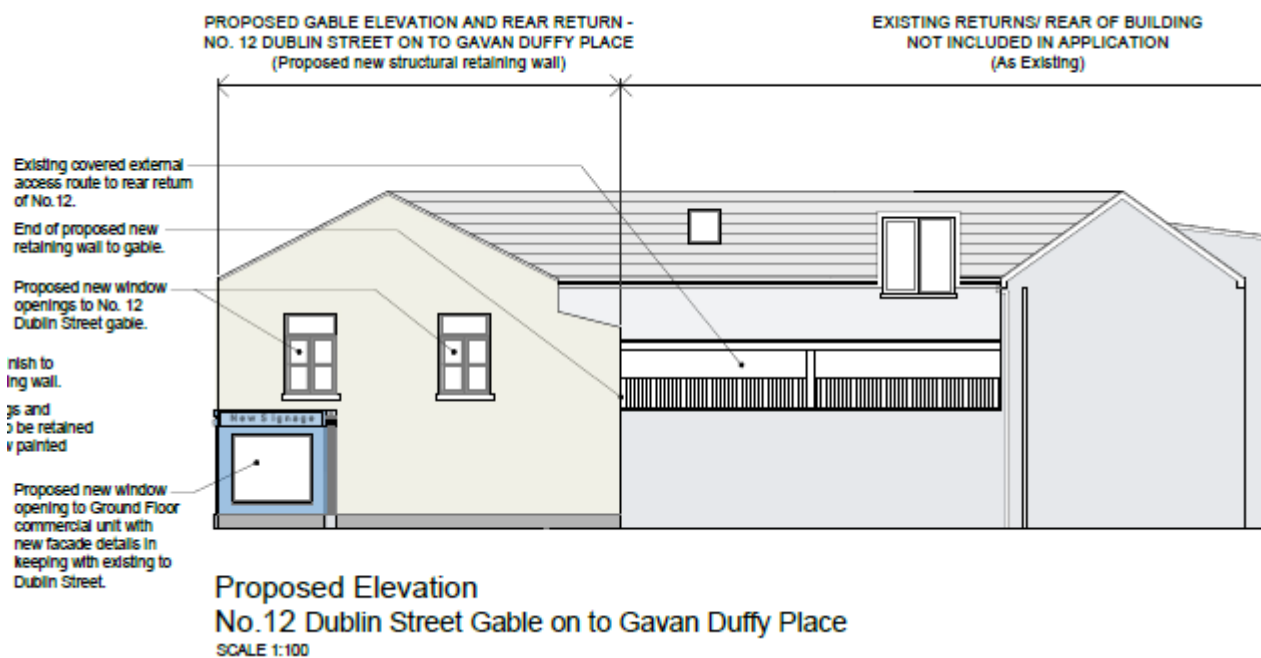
Excerpt from Planning Drawing A-20-002 showing the proposed elevation on the new gable of No 12/13 Dublin Street (Mr Malik Kebab)
